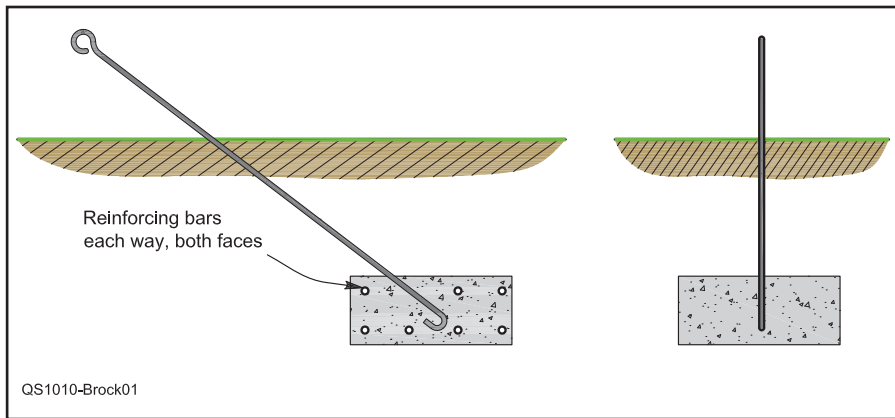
Detailed views of typical concrete encased buried guy anchor and rod. See www.rohnnet.com for detailed information about anchoring their towers.
